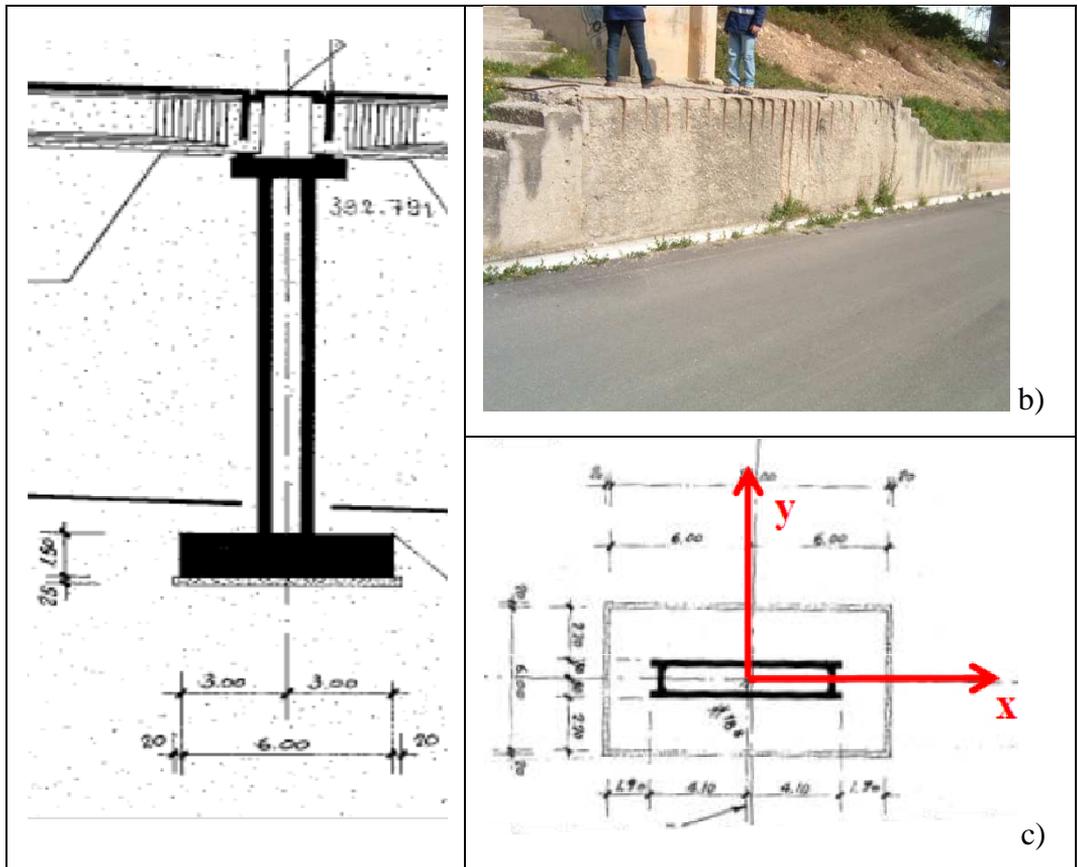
Examples of viaduct with shallow foundations. a) Longitudinal pier section; b) Picture of foundation; c) Foundation dimensions in plant view of the foundations. The dimension are in meter.
